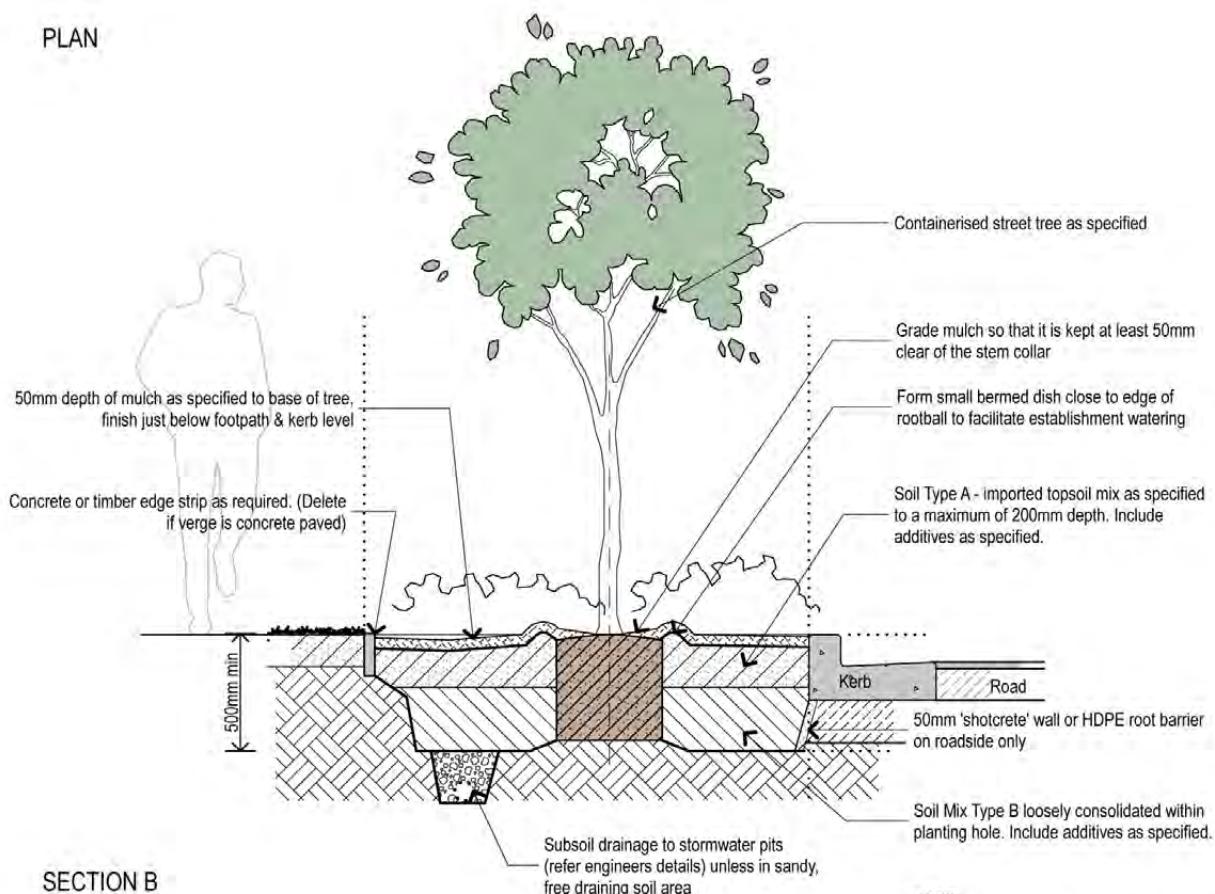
TREE PLANTING IN FULLY PAVED VERGE WITH EXPANDED TREE PIT GARDEN
